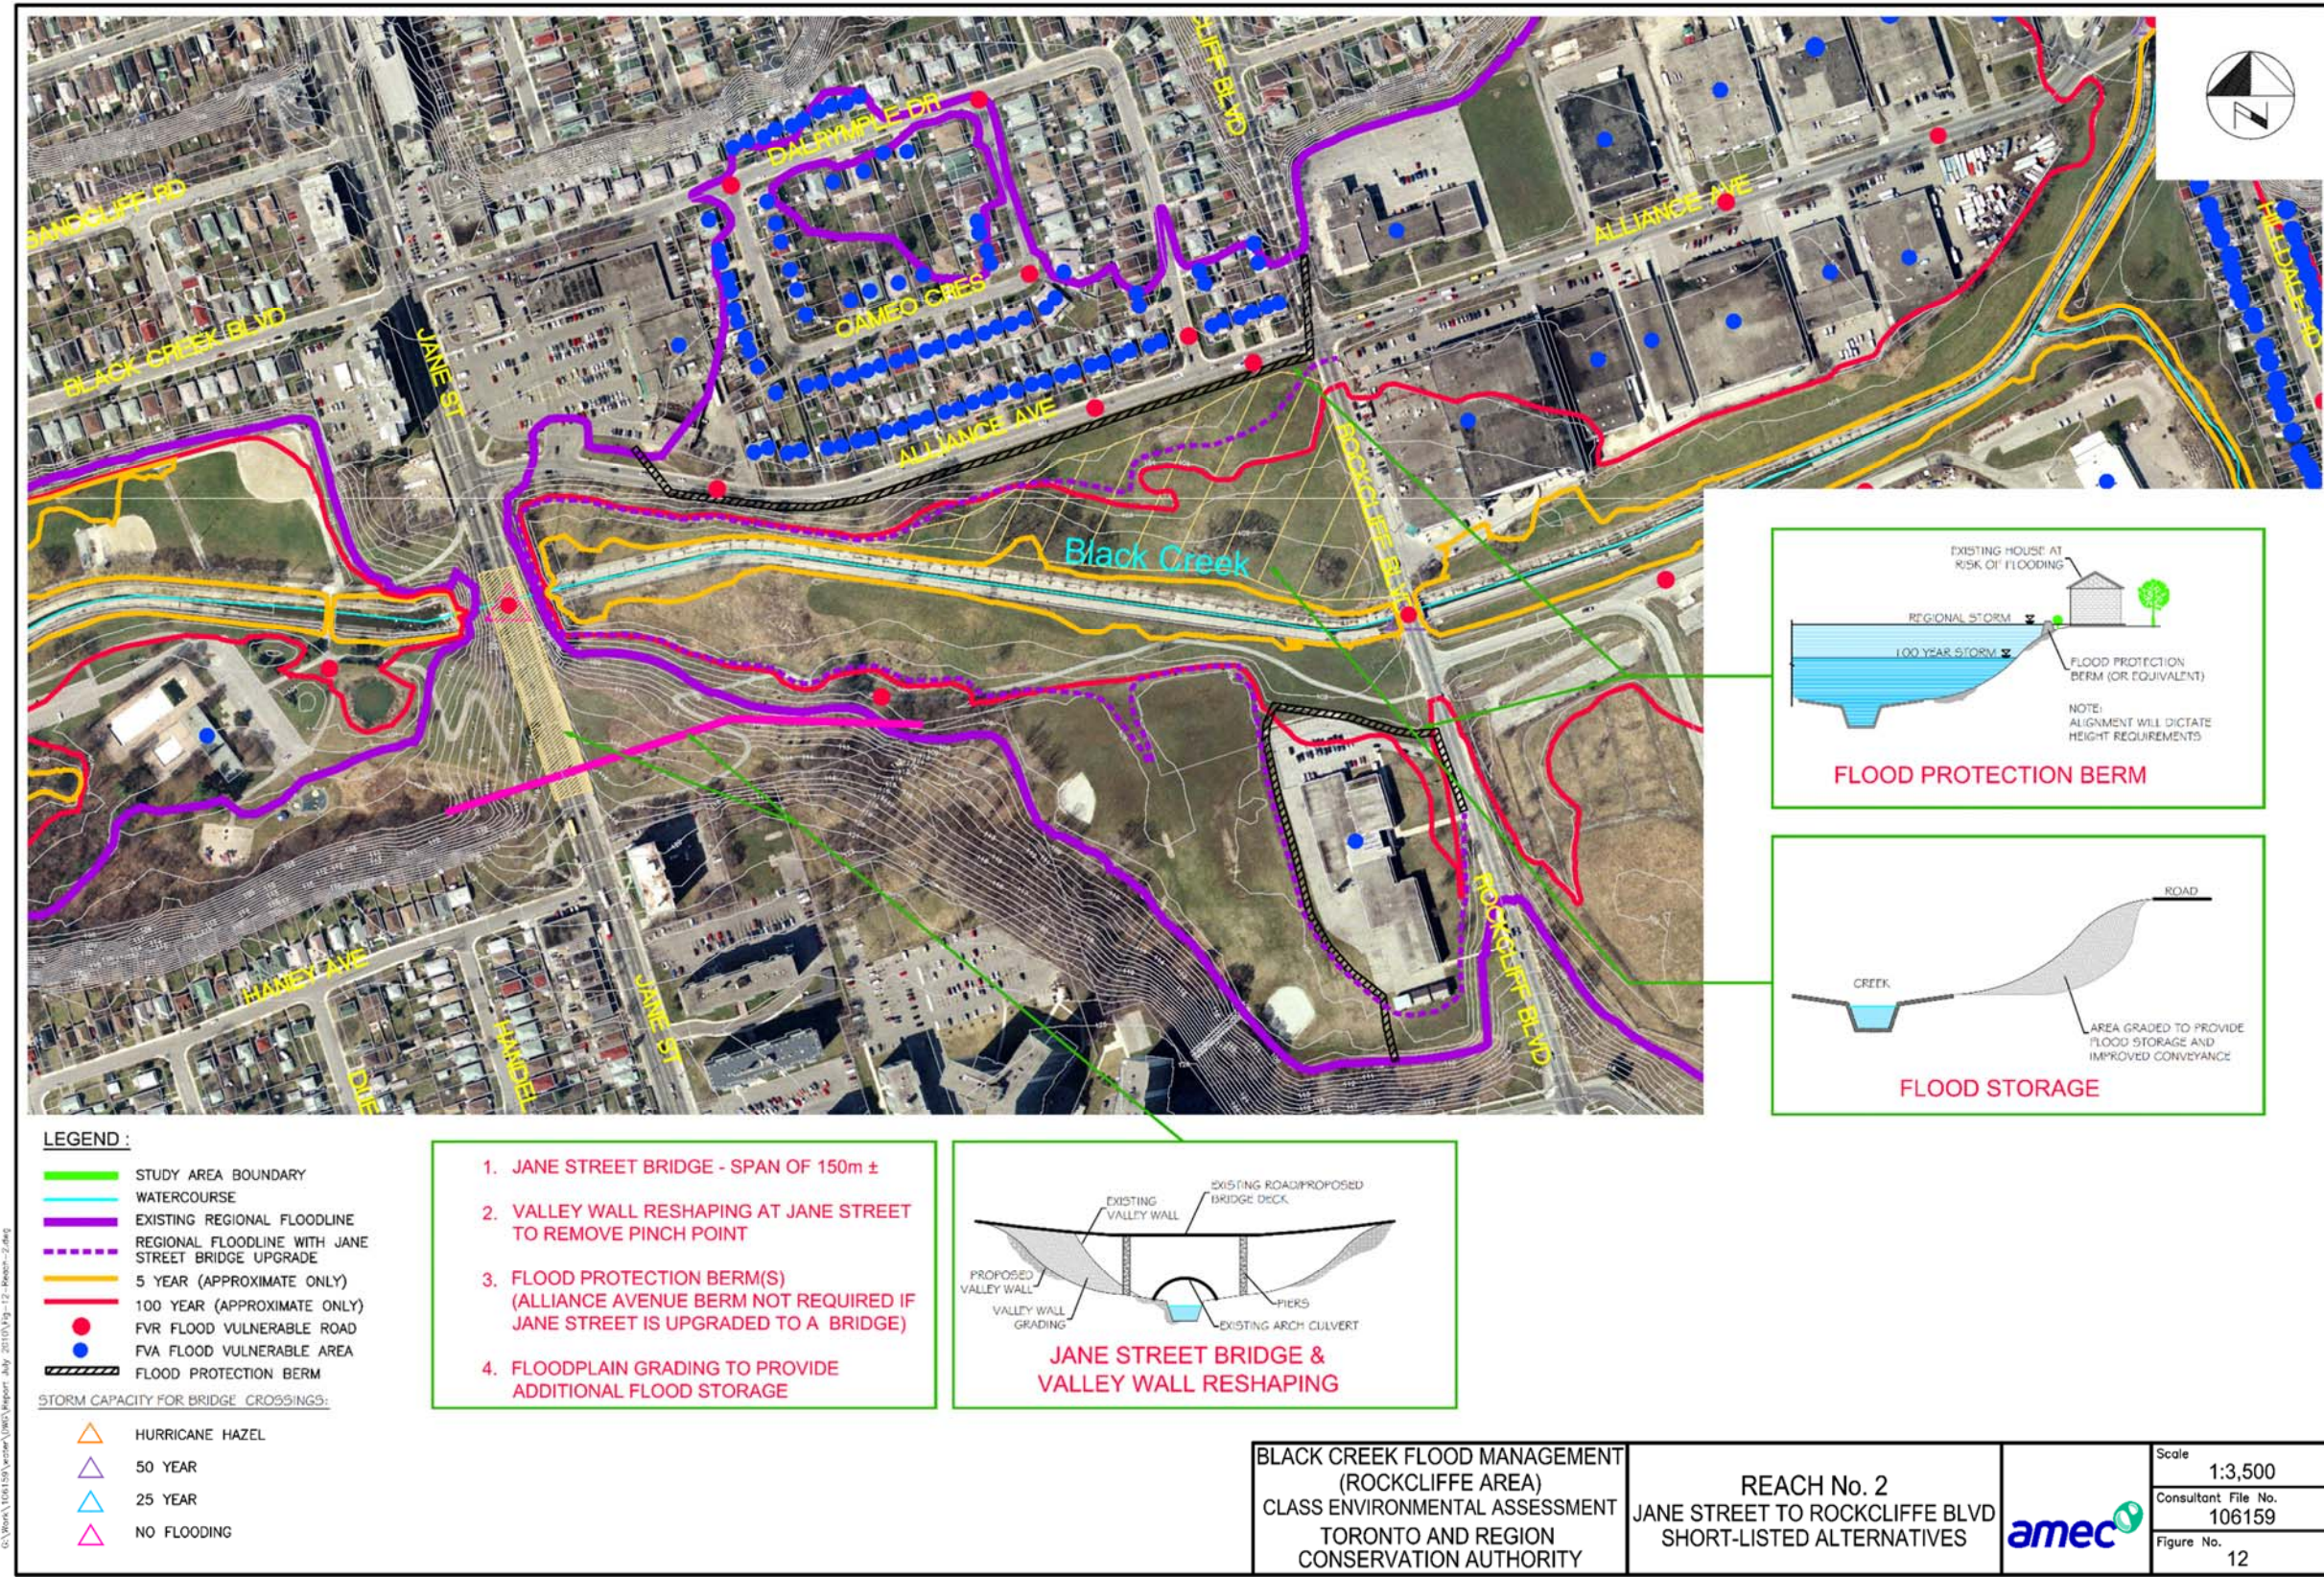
Reach No. 2 – Jane Street to Rockcliffe Boulevard Class EA Short-Listed Alternatives
